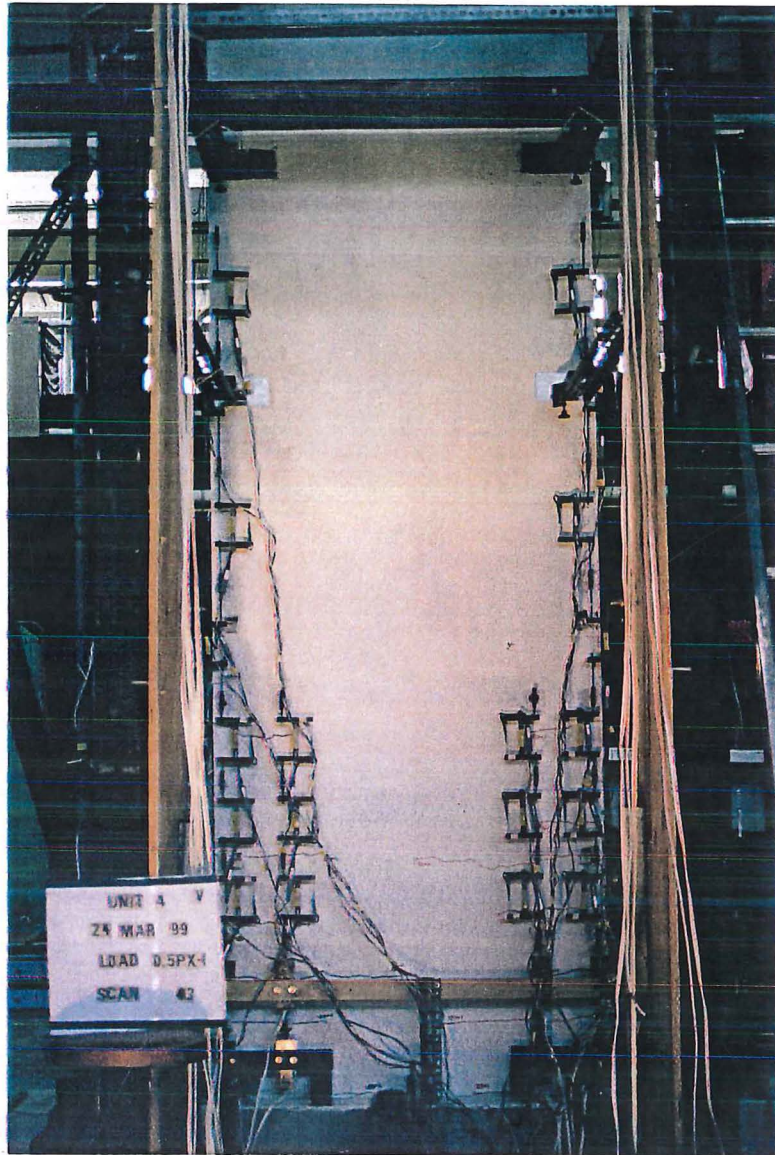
View of Unit 4 at cracking strength (South/Concave)
